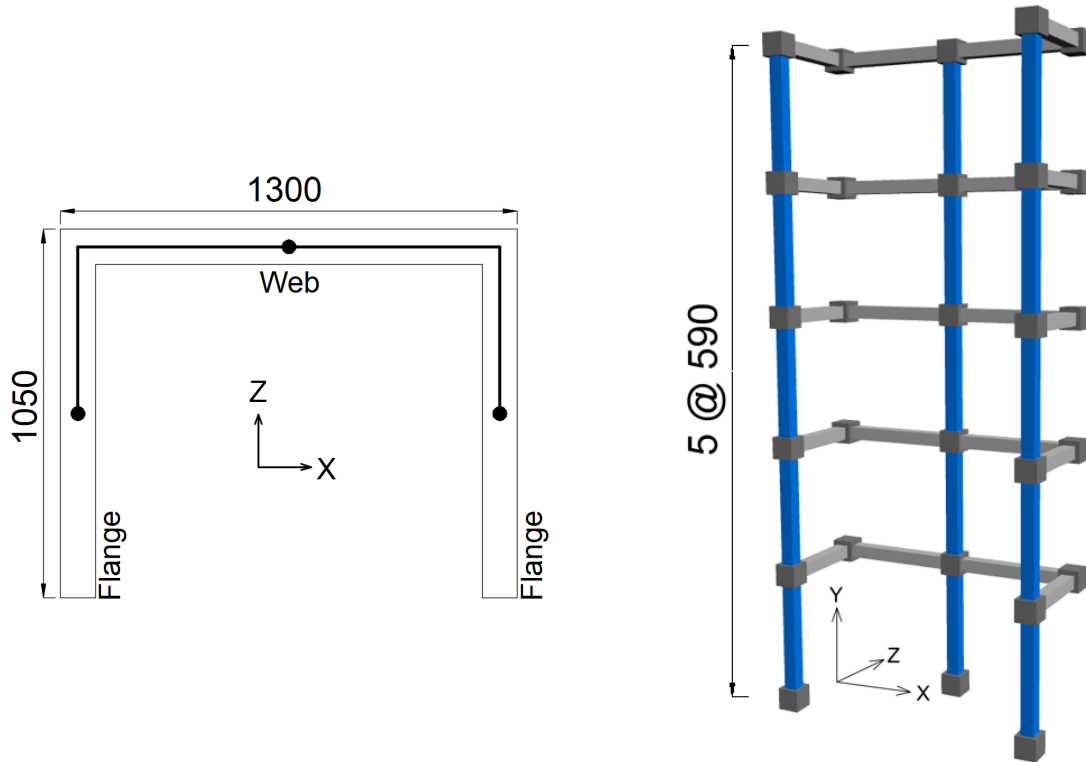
Plan and elevation views of the wide-column model for TUB [Unit: mm].
